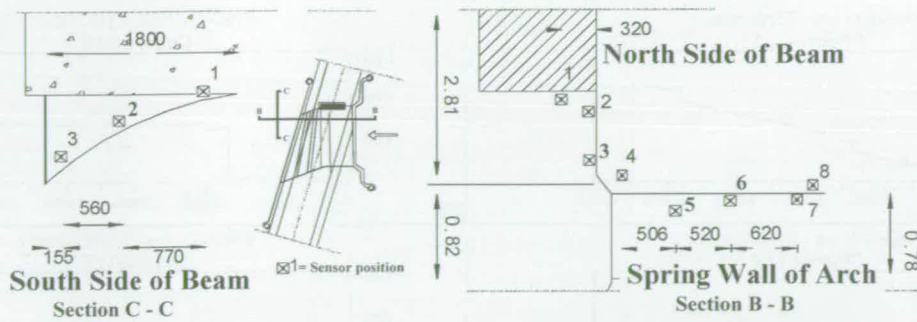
Elevations showing sensors positions on side of beam and on spring wall.
